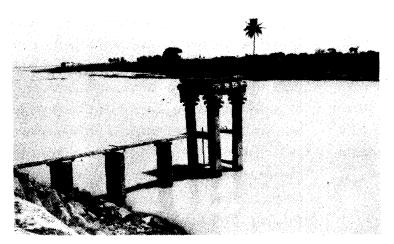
Sluice at the Hoskote Reservoir. Note the stone slabs placed on brick-built columns which provide access to the sluice from the embankment.
